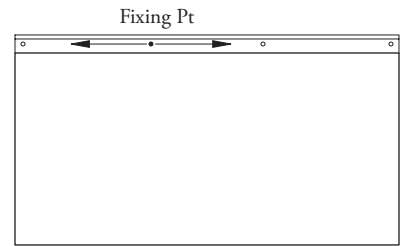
· Each panel should have a single fixing point. The remainder of the holes should be slightly larger than the fasteners.
